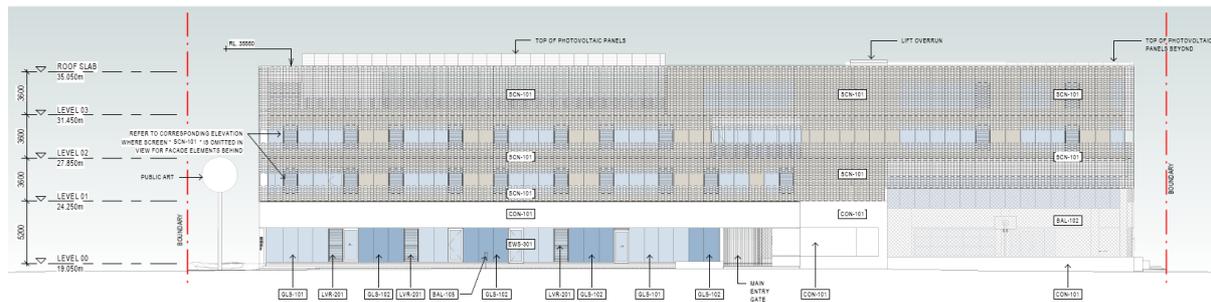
| North Elevation with Flexi-Brick screen (Source: BVN)
